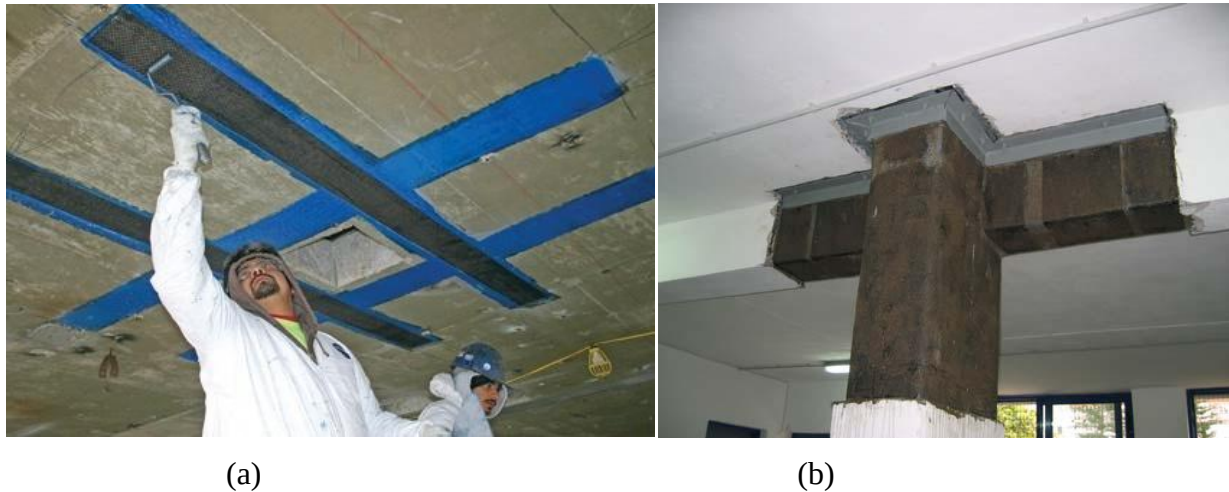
(a). Externally bonded carbon fiber reinforced polymer (FRP) composites strengthen openings in concrete for new mechanical systems in a building being adapted for a new use.
